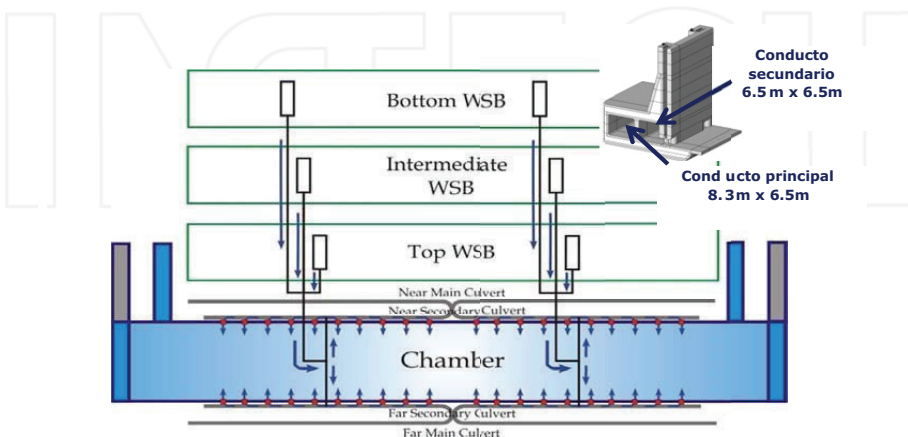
Bottom view of the main conduits (culvert) and water saving basins (WSB).
